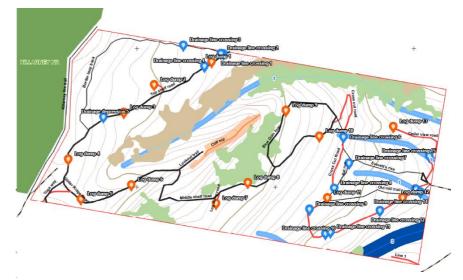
Location of proposed (new) roads in red. Roadside spraying to be implemented in this vicinity.
